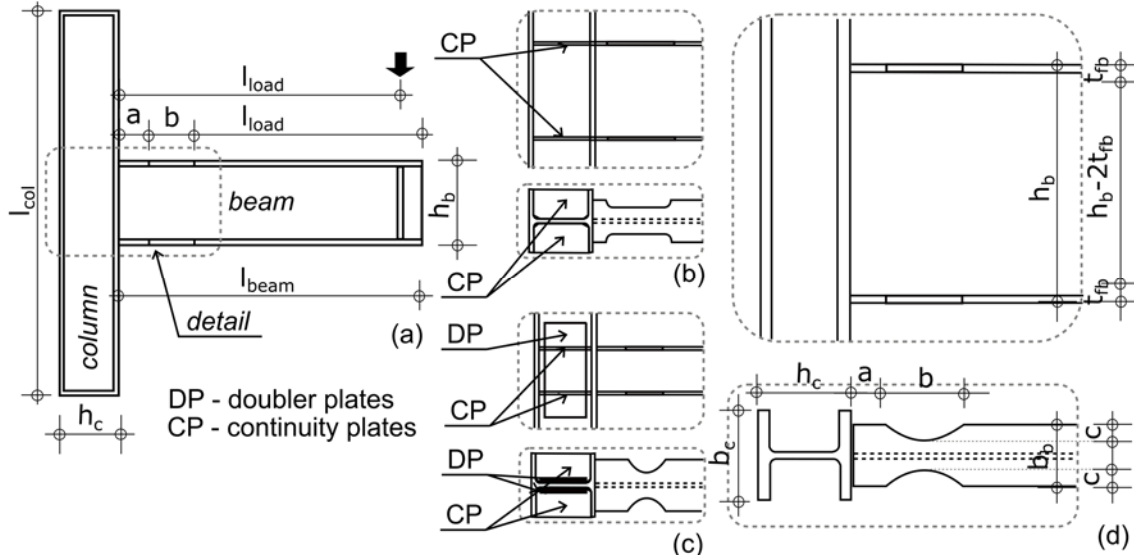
a) Details of an RBS specimen; Connection details for: a) C3B, b) RBSa, c) SP2
